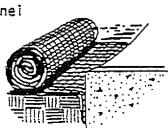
(a) INSTALLATION OF NETTING OR MATTING Note: If provided, follow manufacturer's installation specifications
